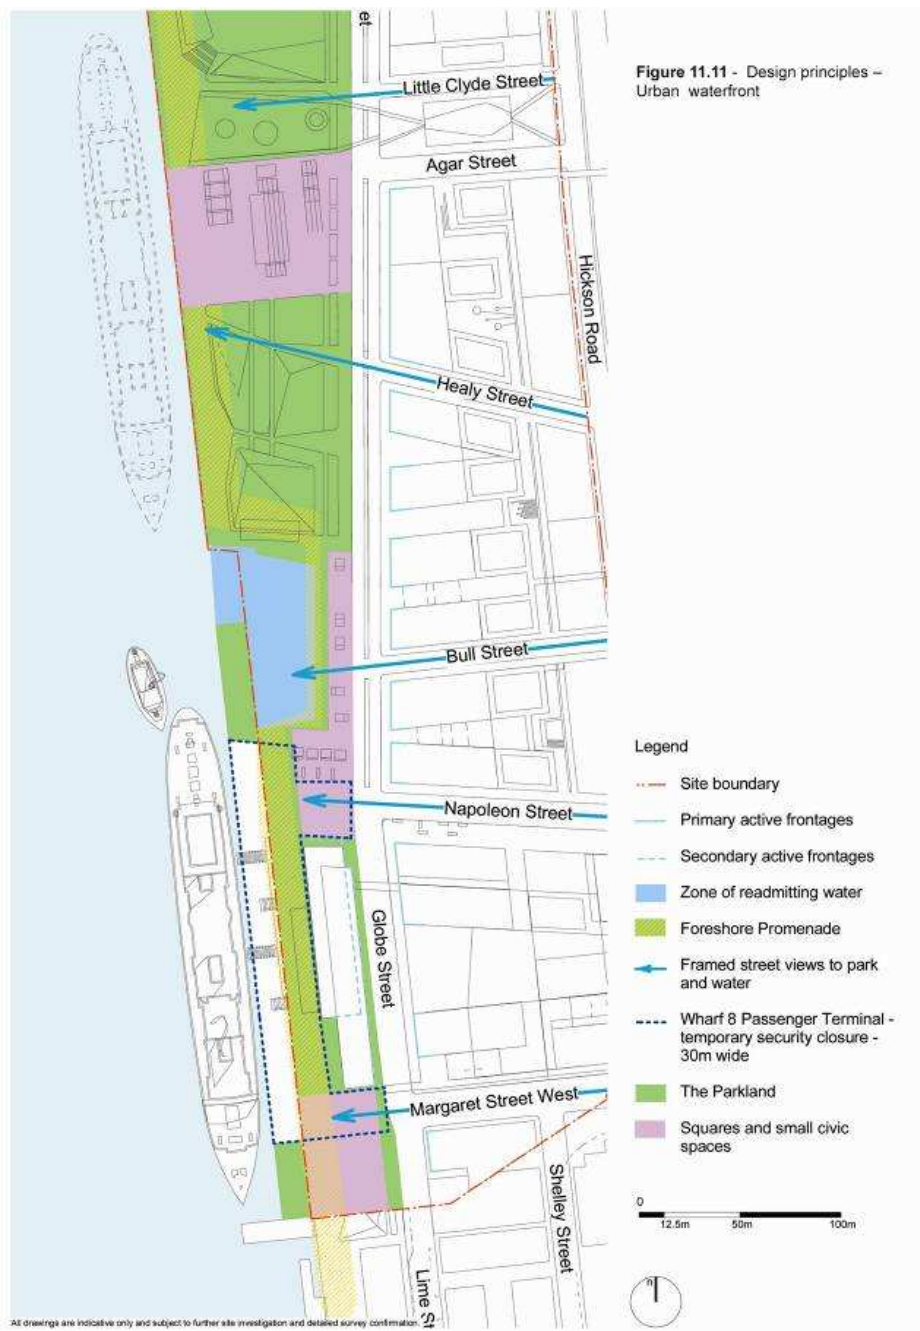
Approved Concept Plan Figure 11.11 – Views and vistas along Healy Street, Bull Street, Napoleon Street and Margaret Street West
